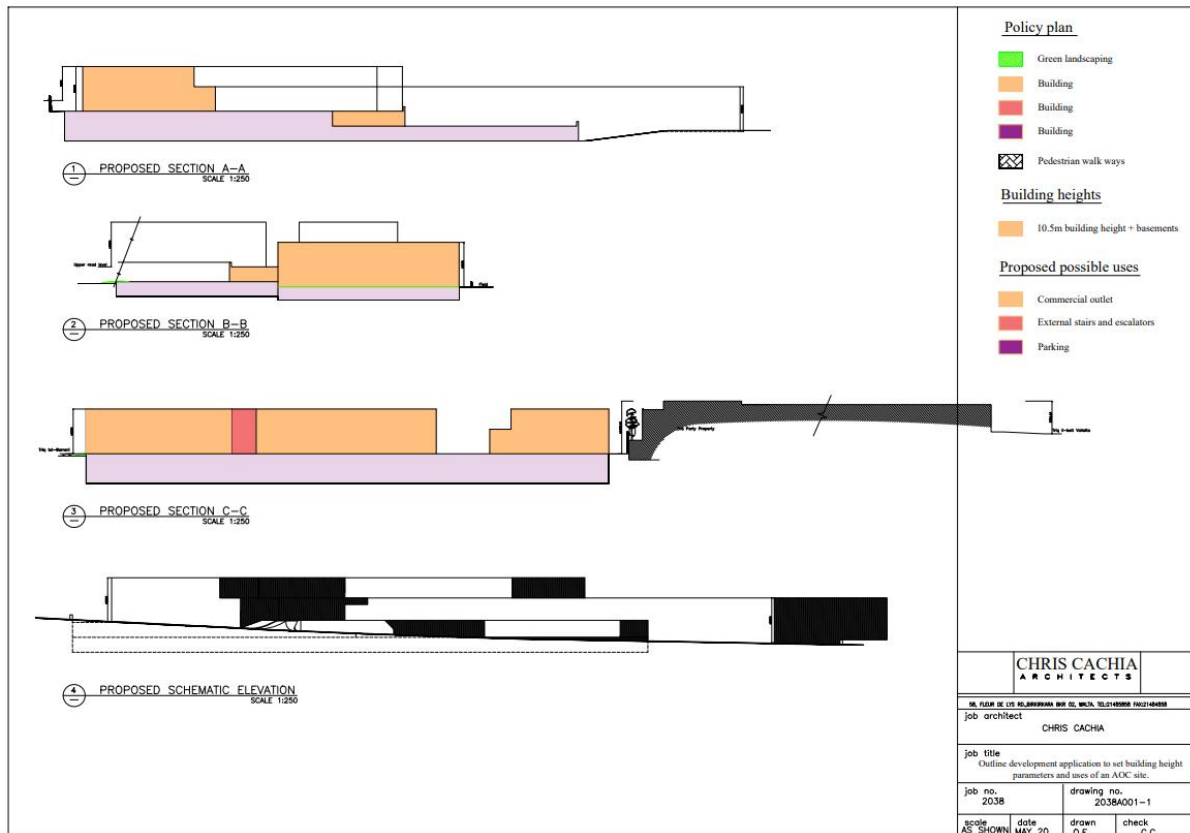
Proposed Sections and Elevations (Source: E-apps PA/05152/20/72a).
